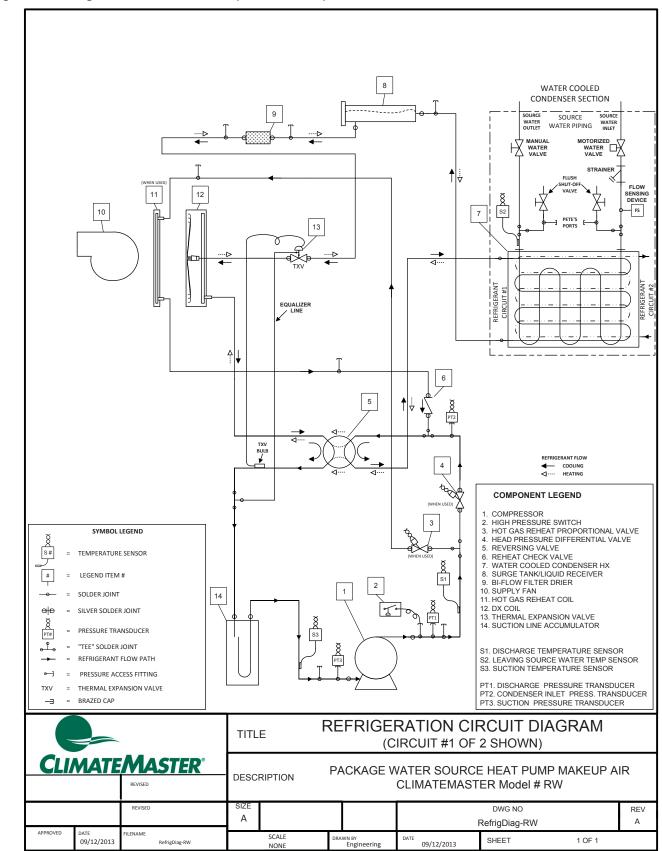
Packaged Water Cooled - Make Up Air, Heat Pump
